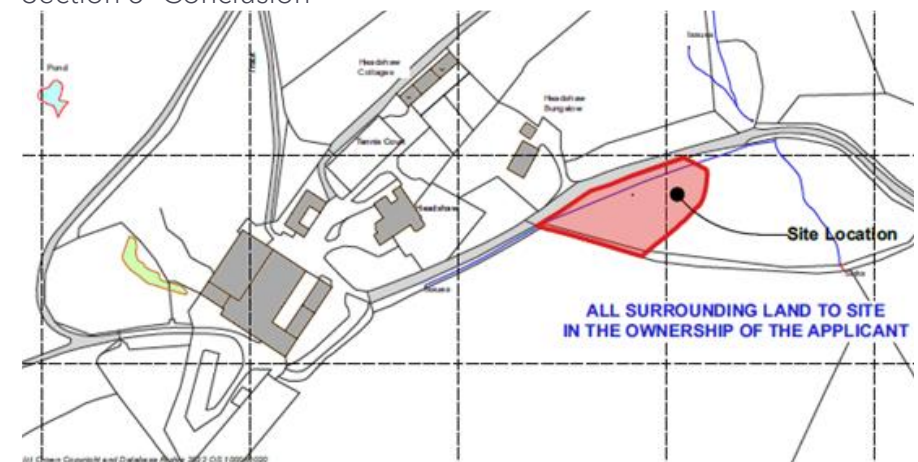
Site Location Plan (Source: Keith Renton Architects).
